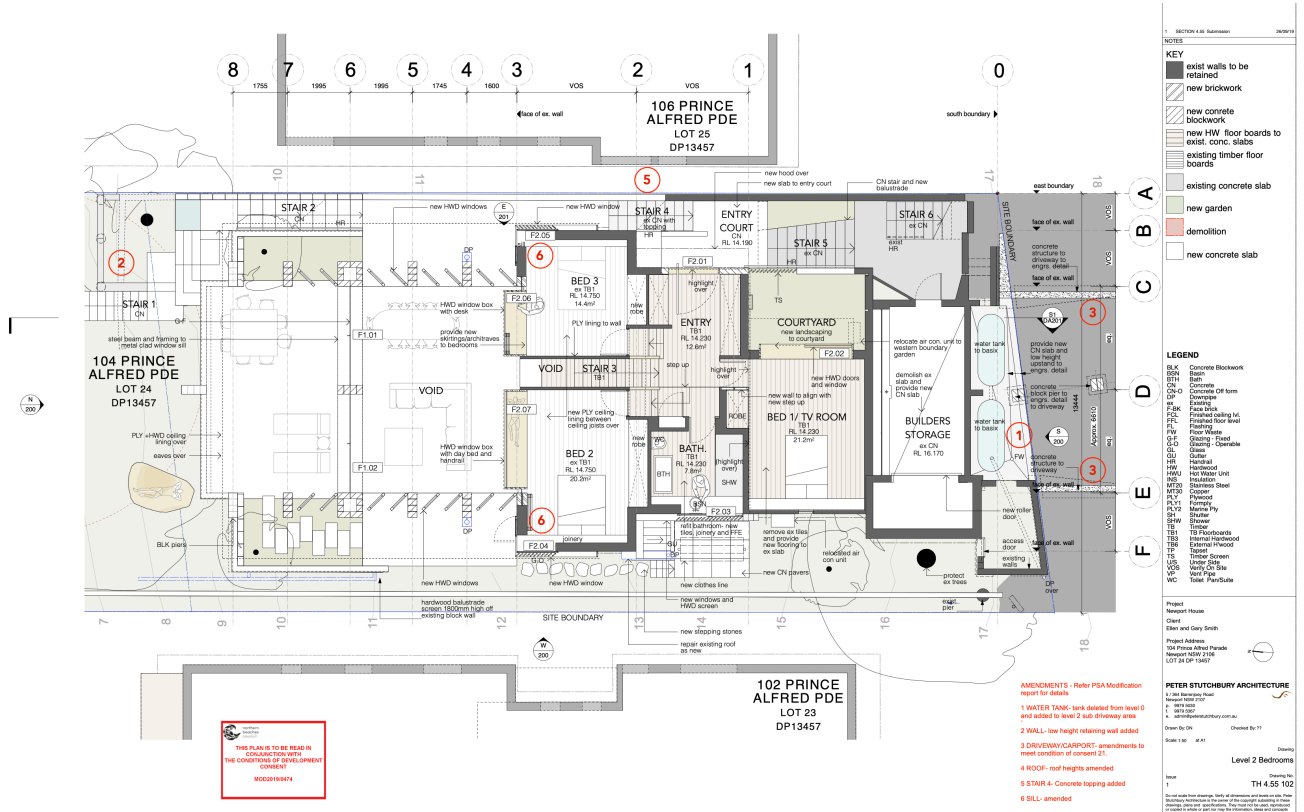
Section 4.55 Stamped plan TH 4.55 102- Level 2 Plan
